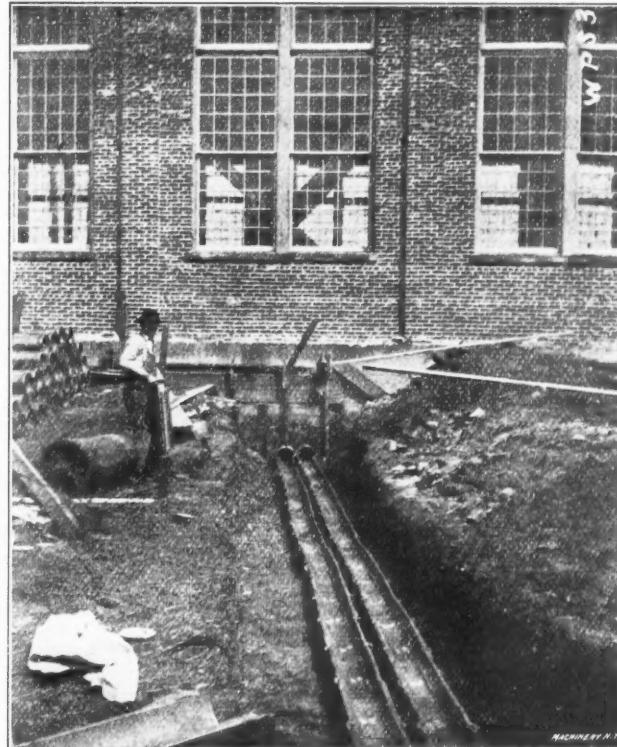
Laying Split Tile Pipe for Running Pipes Underground.
